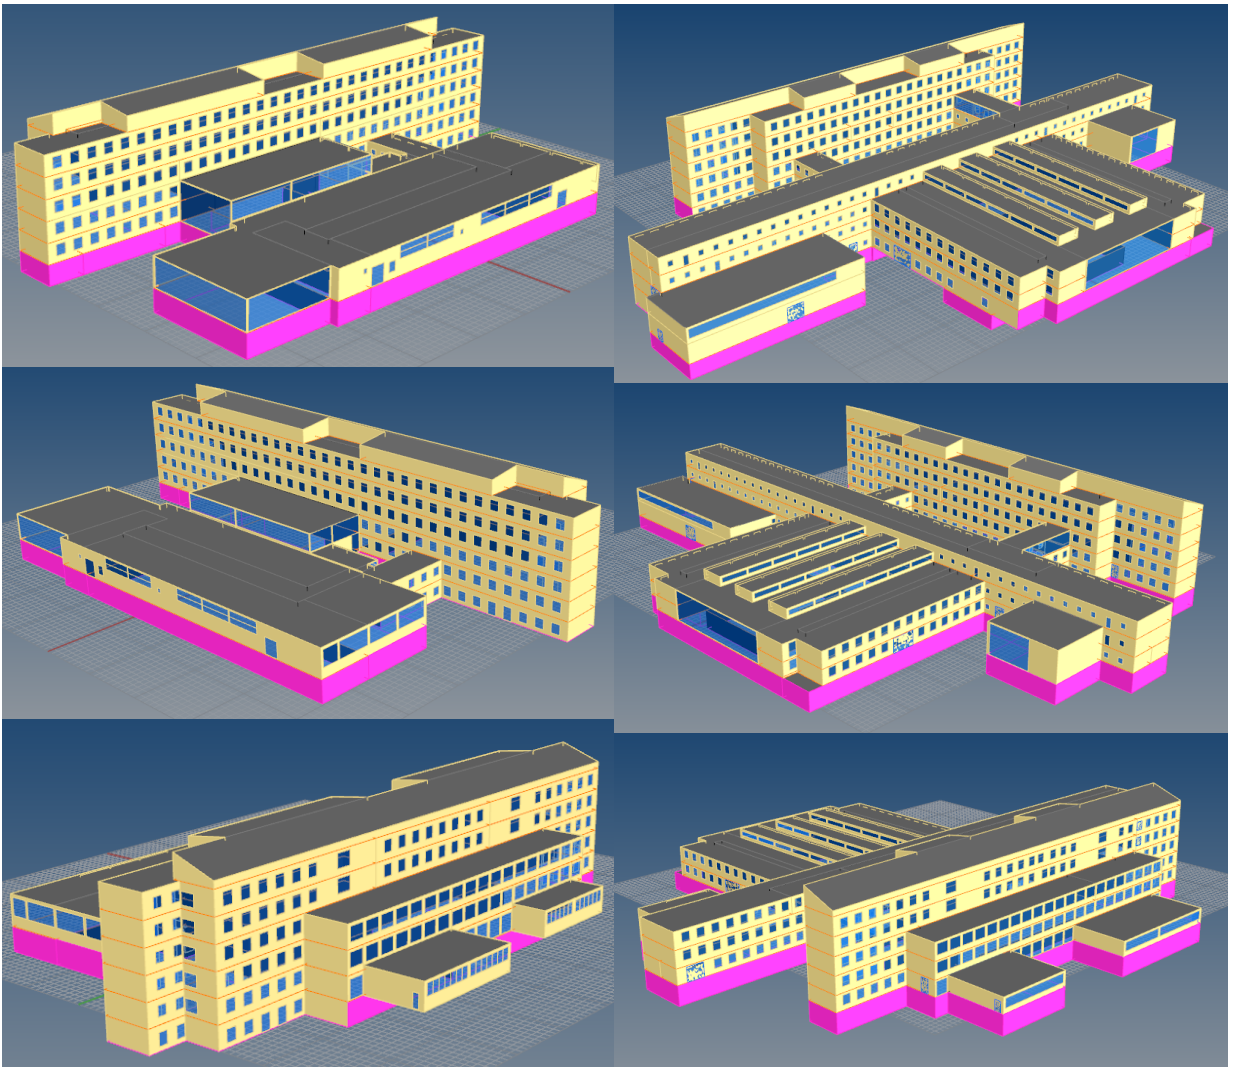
A-Building (left) and V-Building (right) (Illustration by the author)
